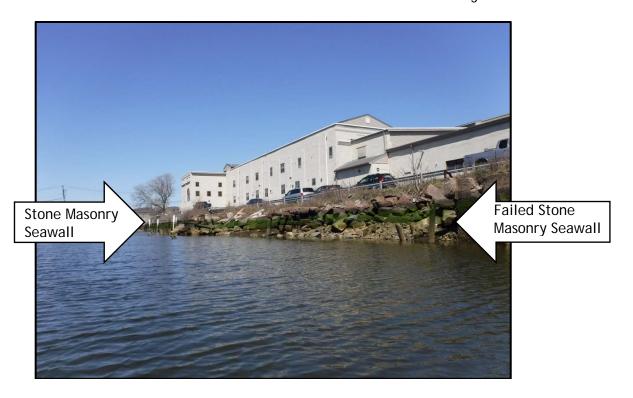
Stone masonry seawall along the Powerhouse Building, looking northeast, photo taken April 14, 2016.
